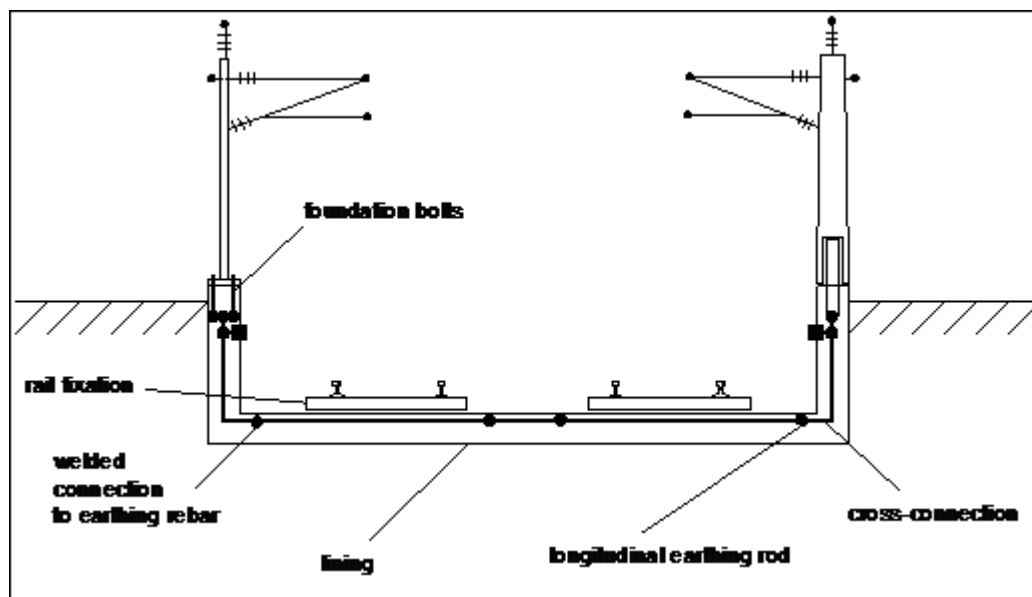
Illustrates both typical steel and concrete masts.
